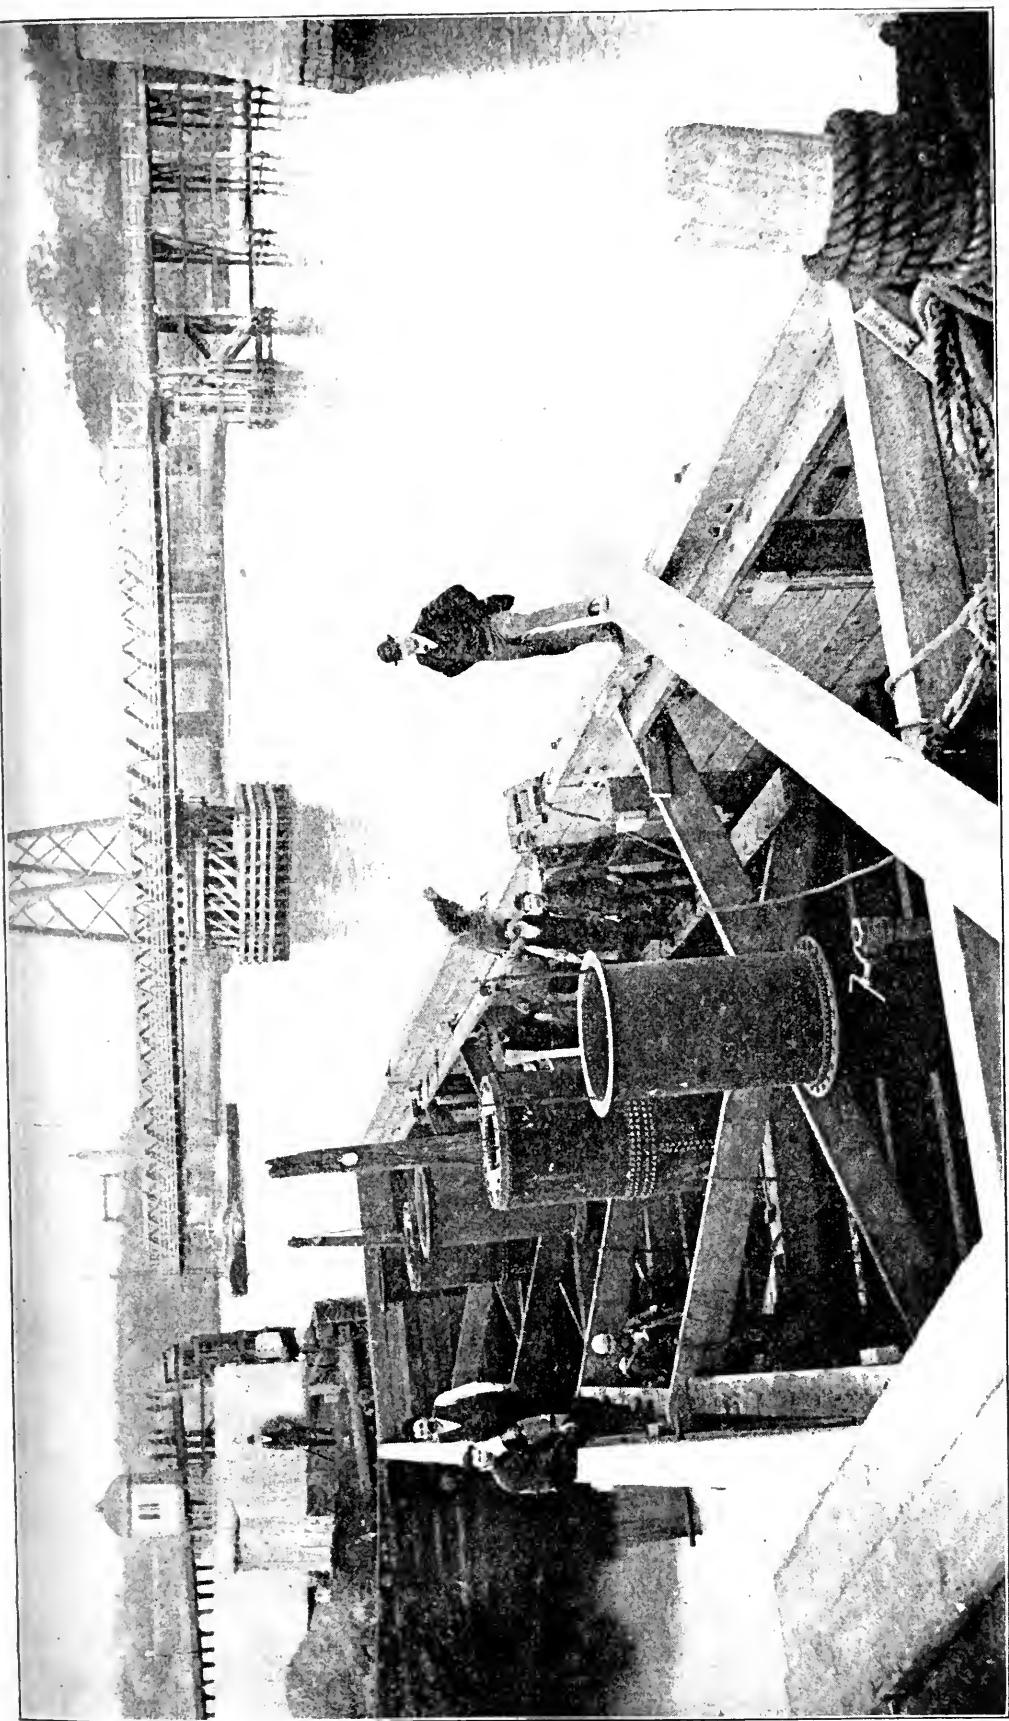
WEST ABUTMENT CAISSON, CENTRAL BRIDGE, 155TH STREET, NEW YORK CITY.
